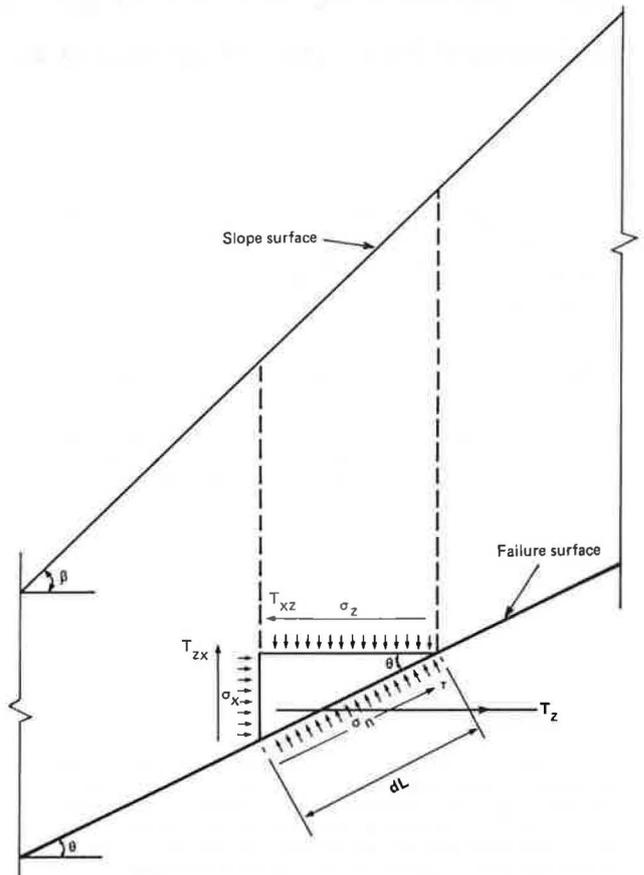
Forces on element of reinforced soil immediately above failure surface
